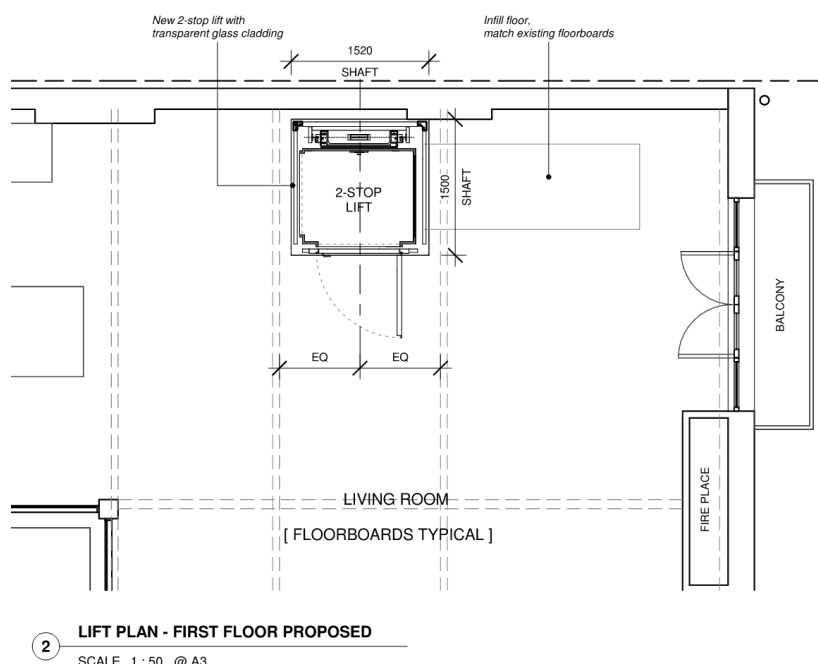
Lift Plan – First Floor Proposed (Source: HallGroup & Co)
